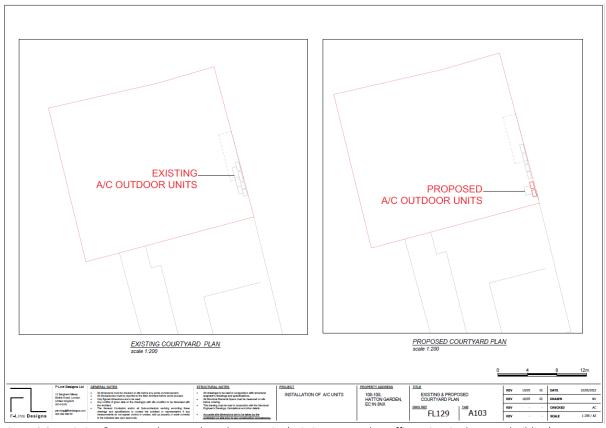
Existing & proposed external condenser units (existing serve other office suites in the same building)
